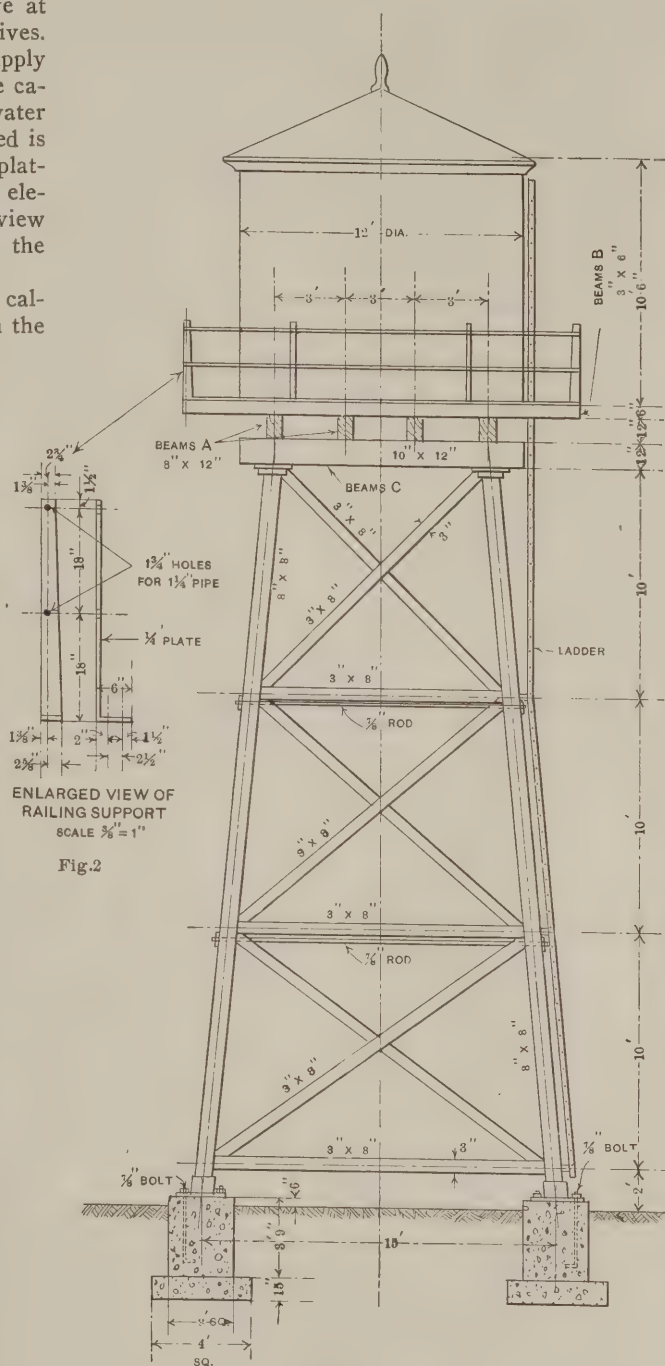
Elevation of Tank and Tower.—Scale  $\frac{1}{8}$  In. to the Foot.
